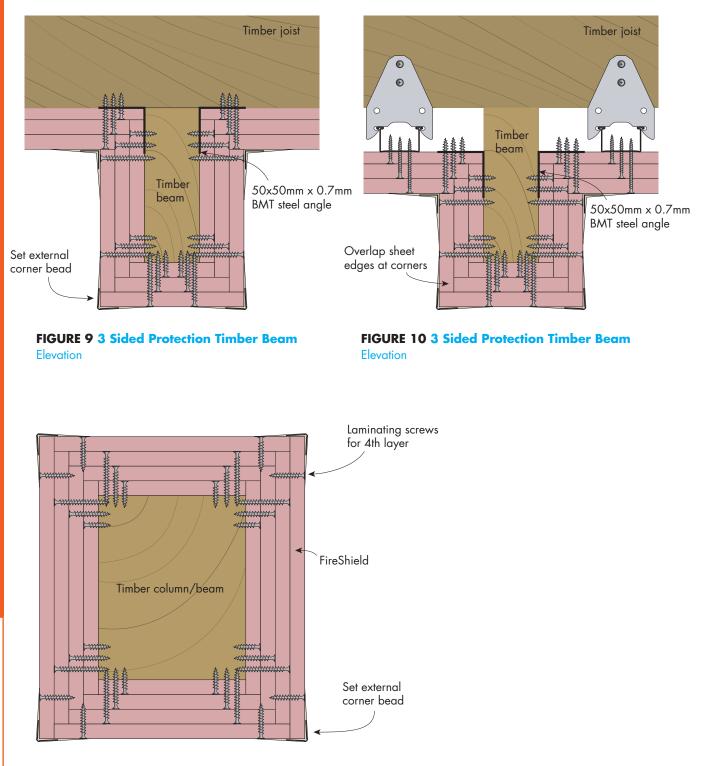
4 Sided Protection Timber Column/Beam Elevation or plan view
